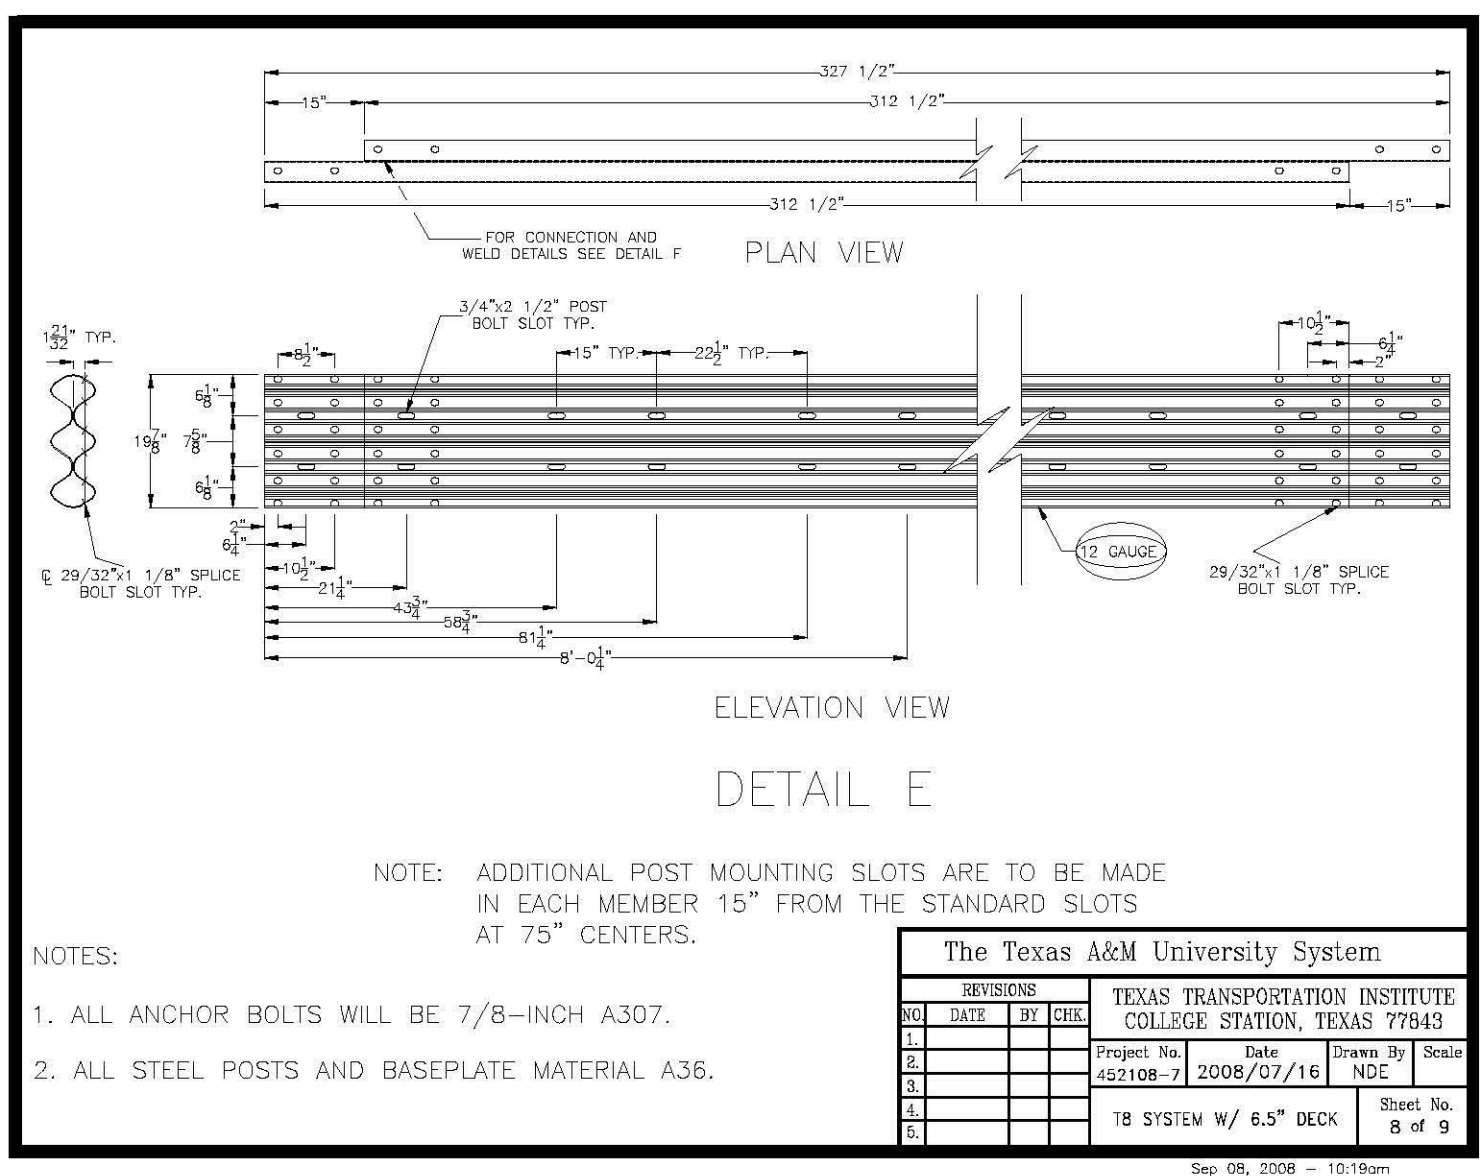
Details of the T8 Bridge Rail Installation – Tubular Thrie Beam Details.
